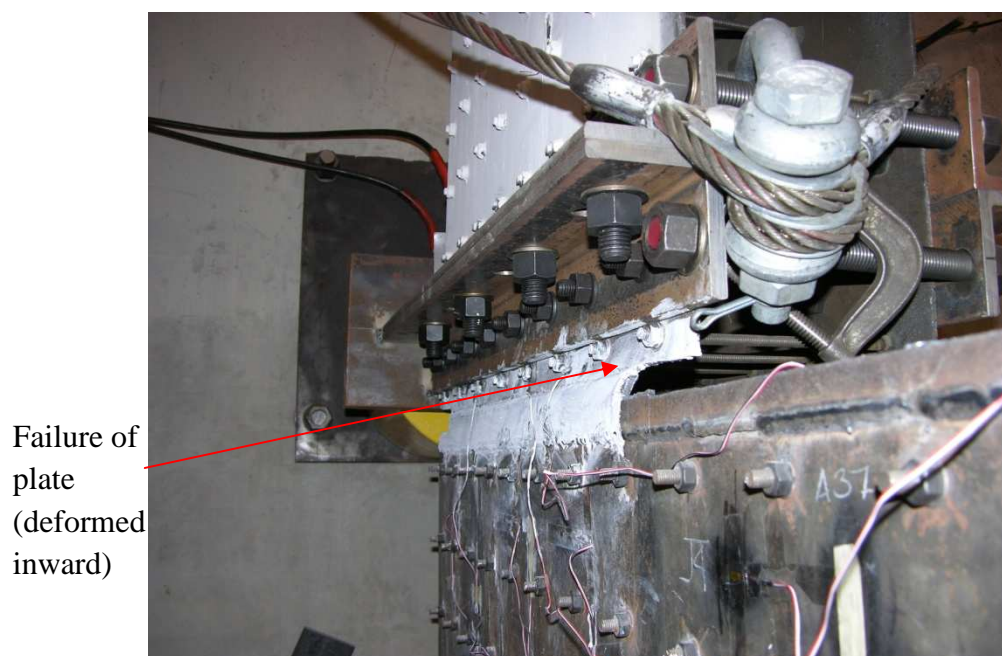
Failure of the Horizontal Connection - Test-1: View 2
